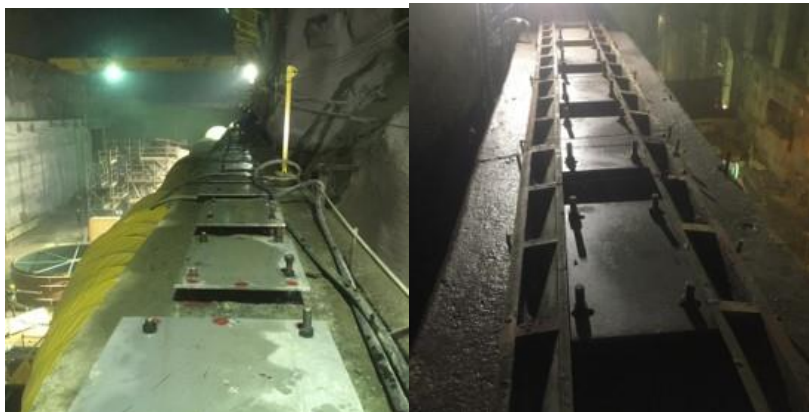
Ongoing installation of overhead travelling cranes rails supports
